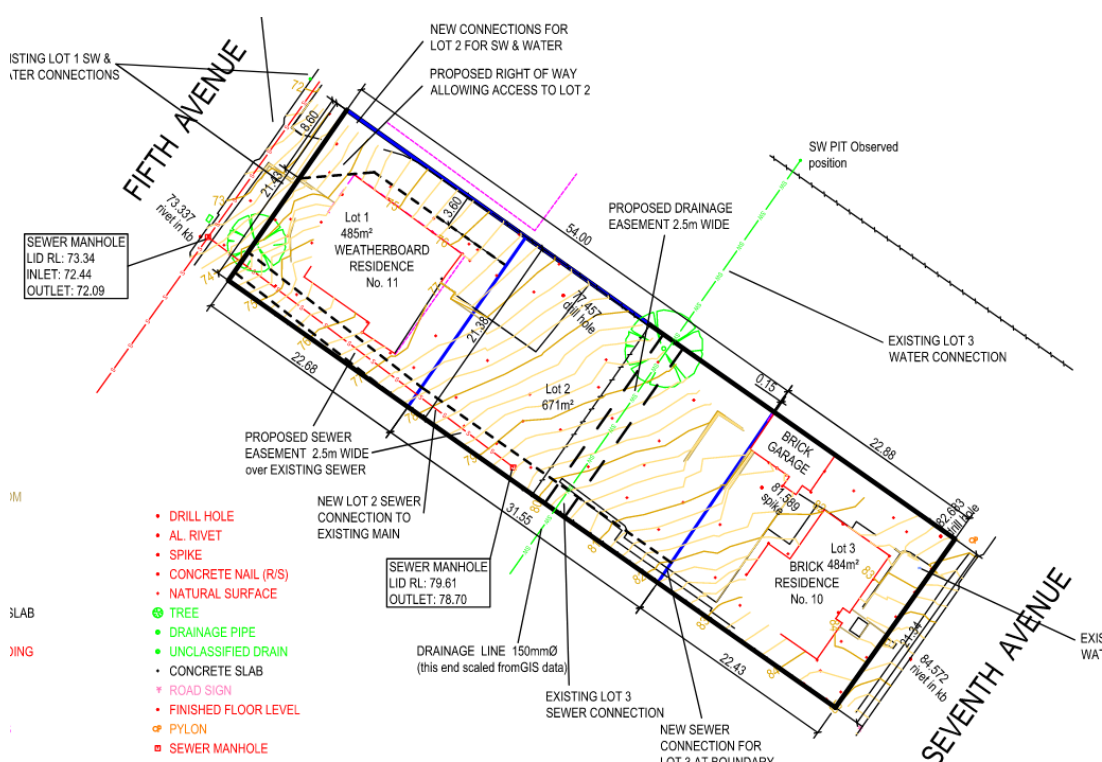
Proposed Plan of Subdivision (Proposed internal lot shown as blue marking)
